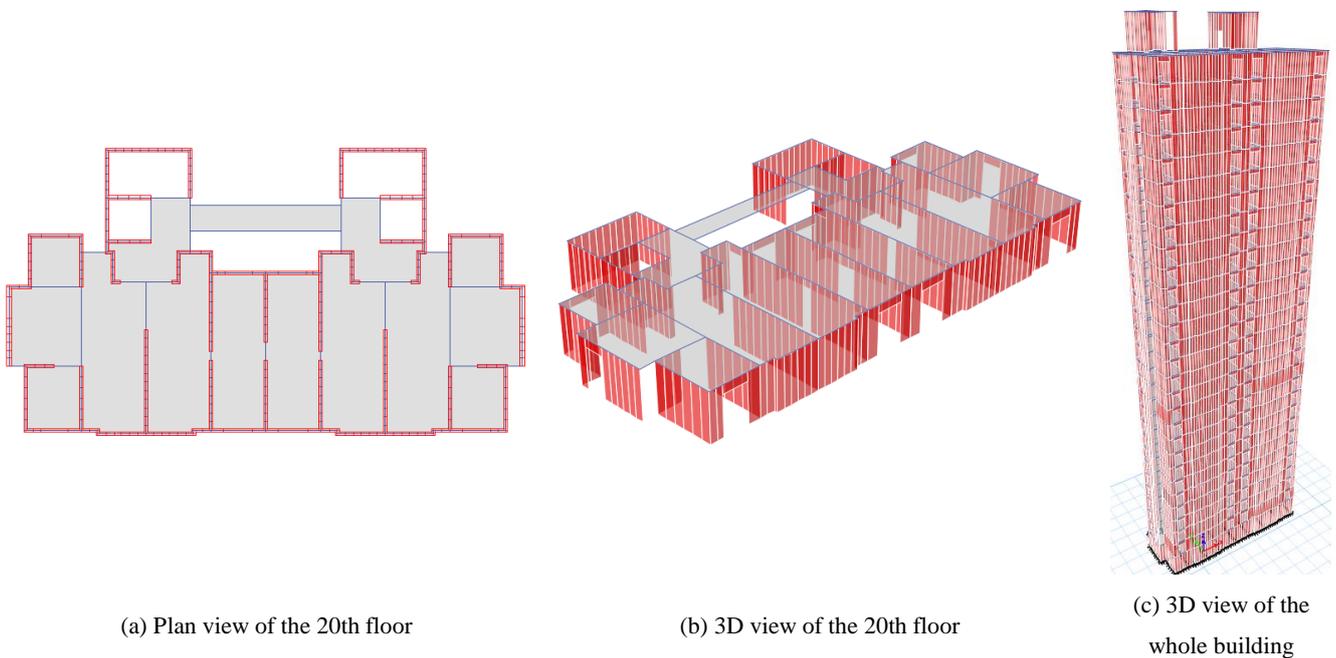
Ground structure and discretization (wall element length = 0.5 m) of the shear walls for model-1
